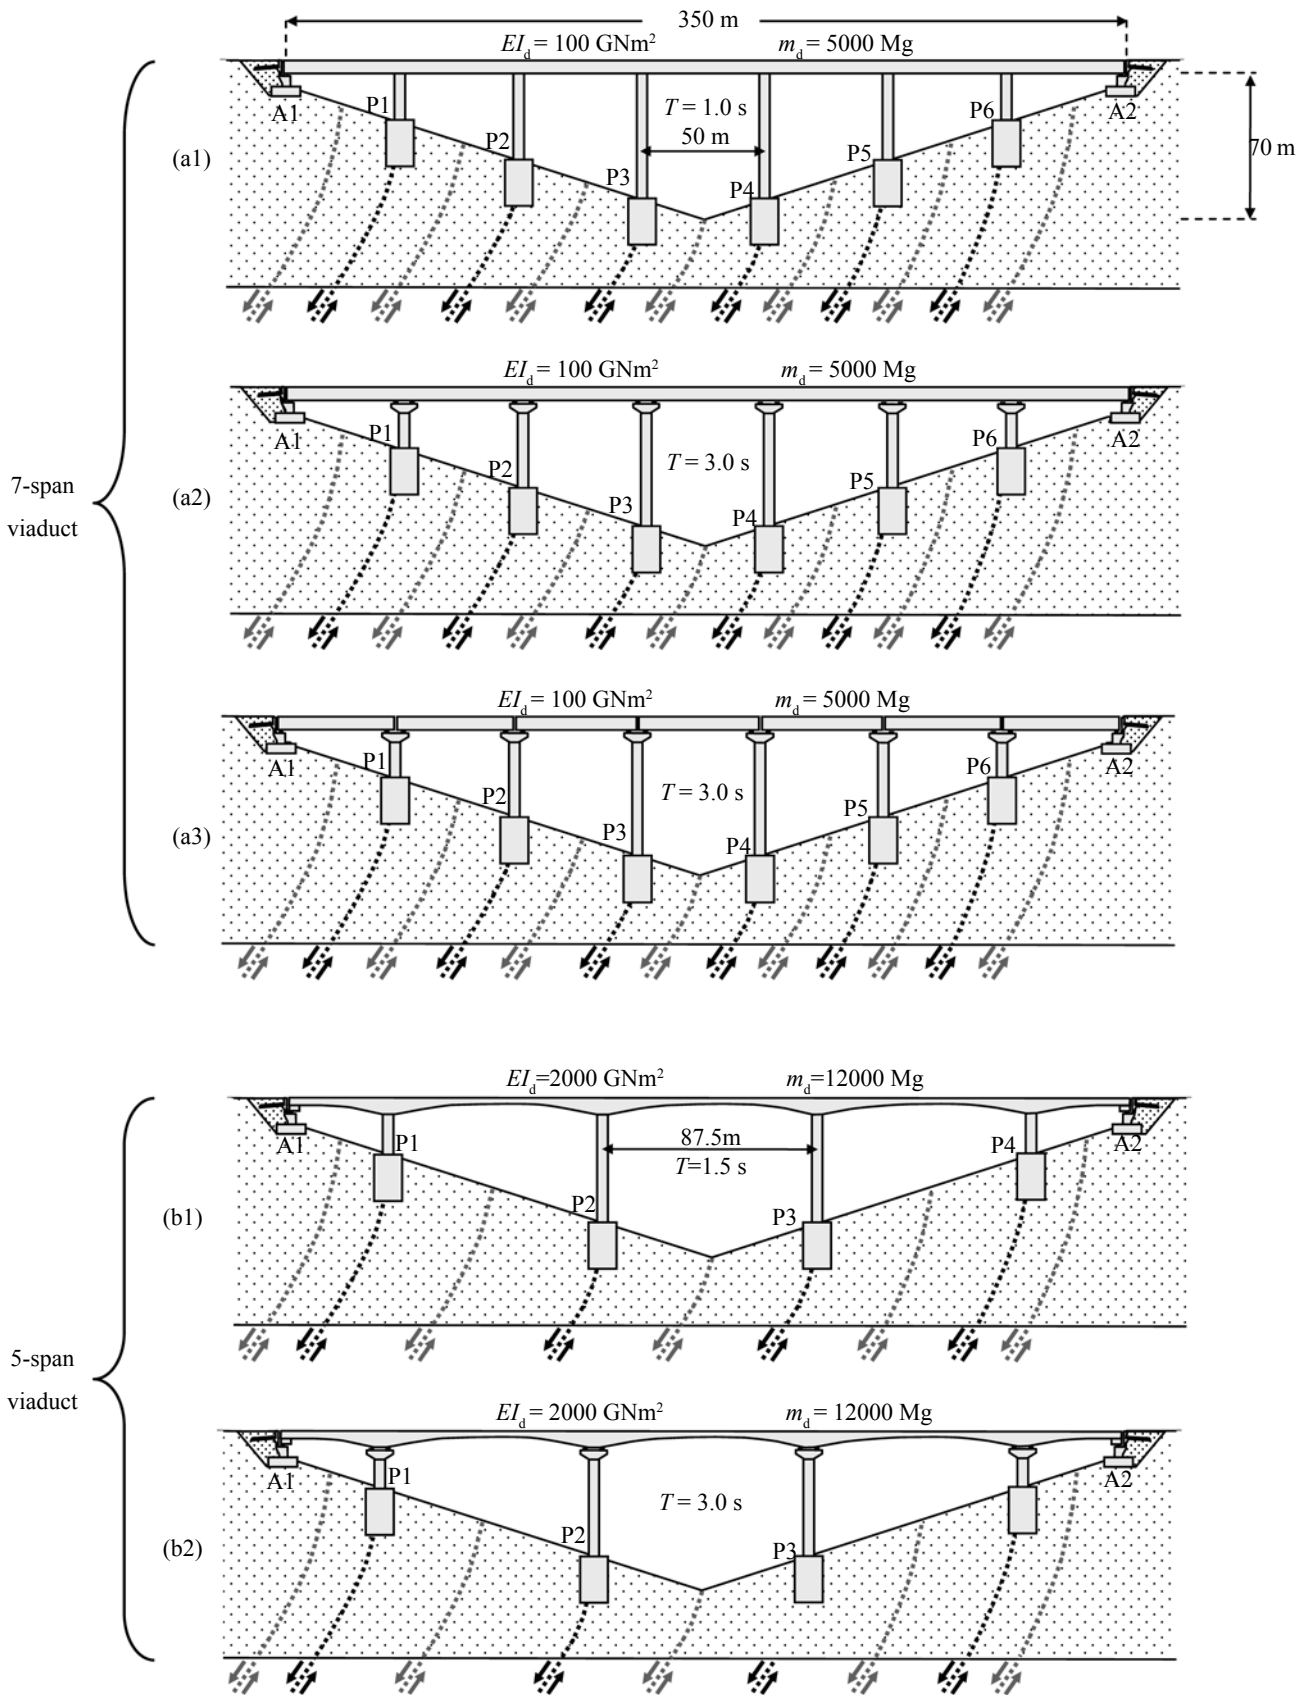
Parametrically investigated viaduct bridges : (a1) 7-span viaduct, continuous deck monolithically connected to piers ; (a2) same system, but deck supported through elastomeric bearings; (a3) 7 simply supported spans on elastomeric bearings ; (b1) 5-span viaduct, continuous deck monolithically connected to piers ; and (b2) same system, but deck on elastomeric bearings
